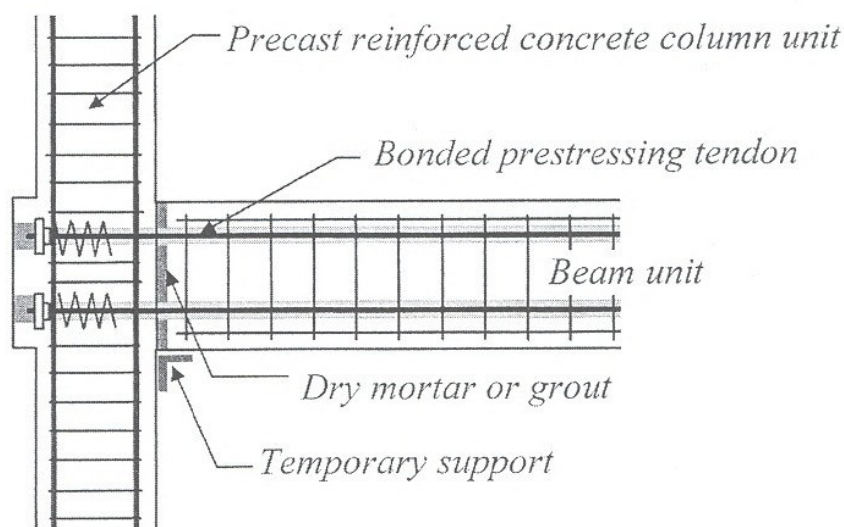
A Precast beam through the column connection (fib, 2003).
